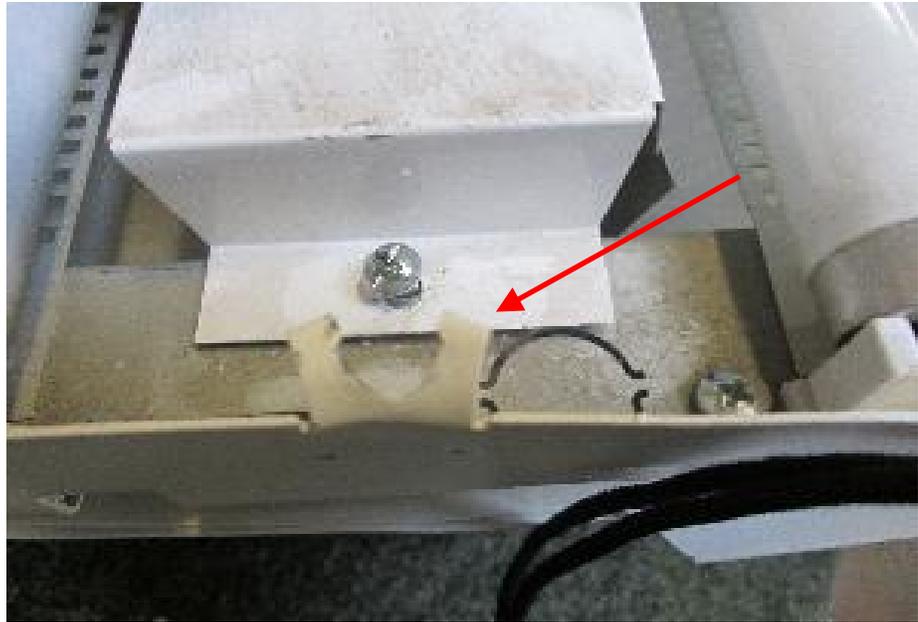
Failed connection at light fixture in Napa Valley Language Academy (photo by Quattrocchi Kwok Architects).
